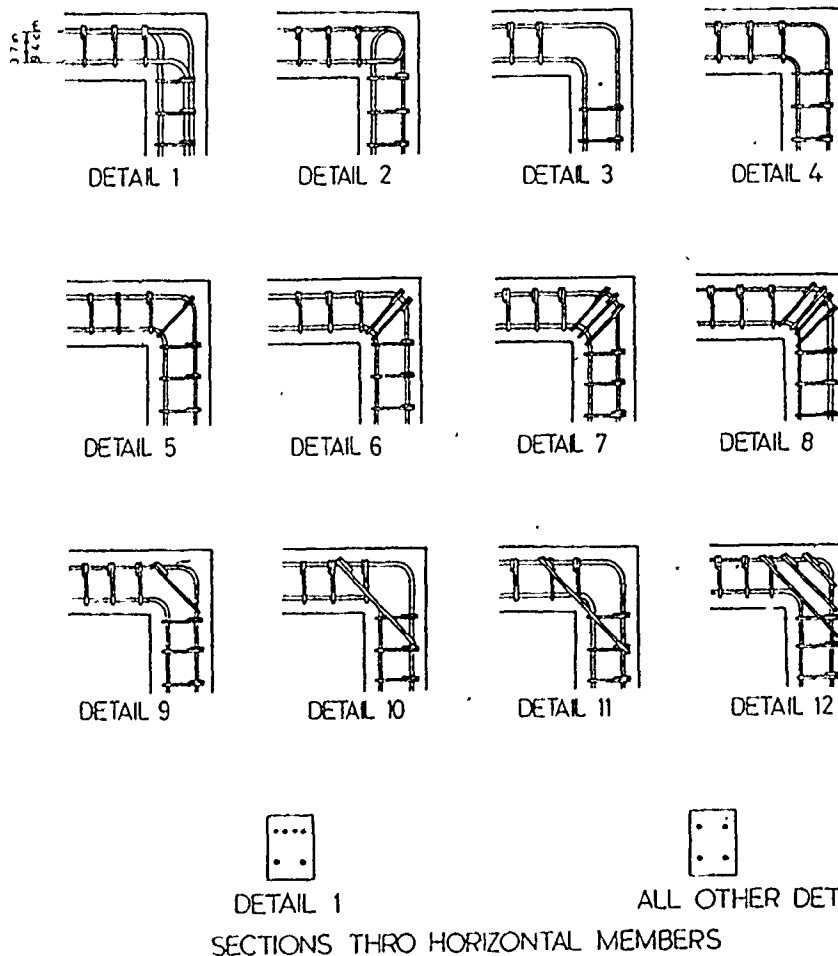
Details of corner reinforcement (The longitudinal steel extends to the end of the flexural member in all details, and is terminated by a standard hook)
